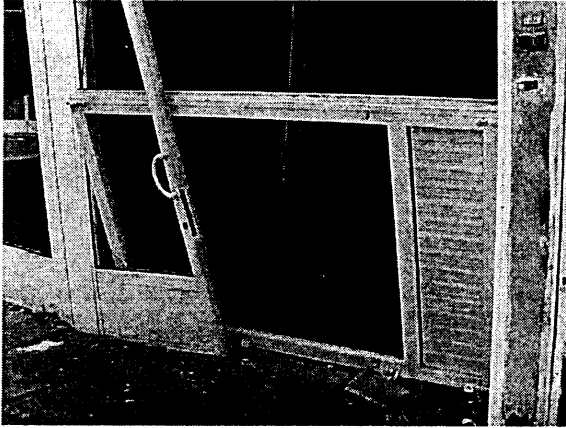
Column punching and floor heave in building E2 (08/25/1999)
